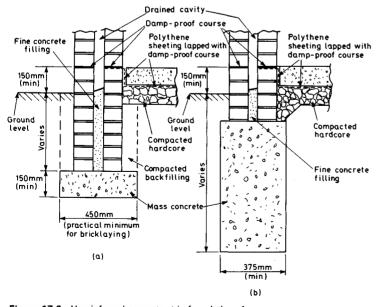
Unreinforced concrete strip foundations for load-bearing walls. (a) Traditional; (b) concrete-filled trench
